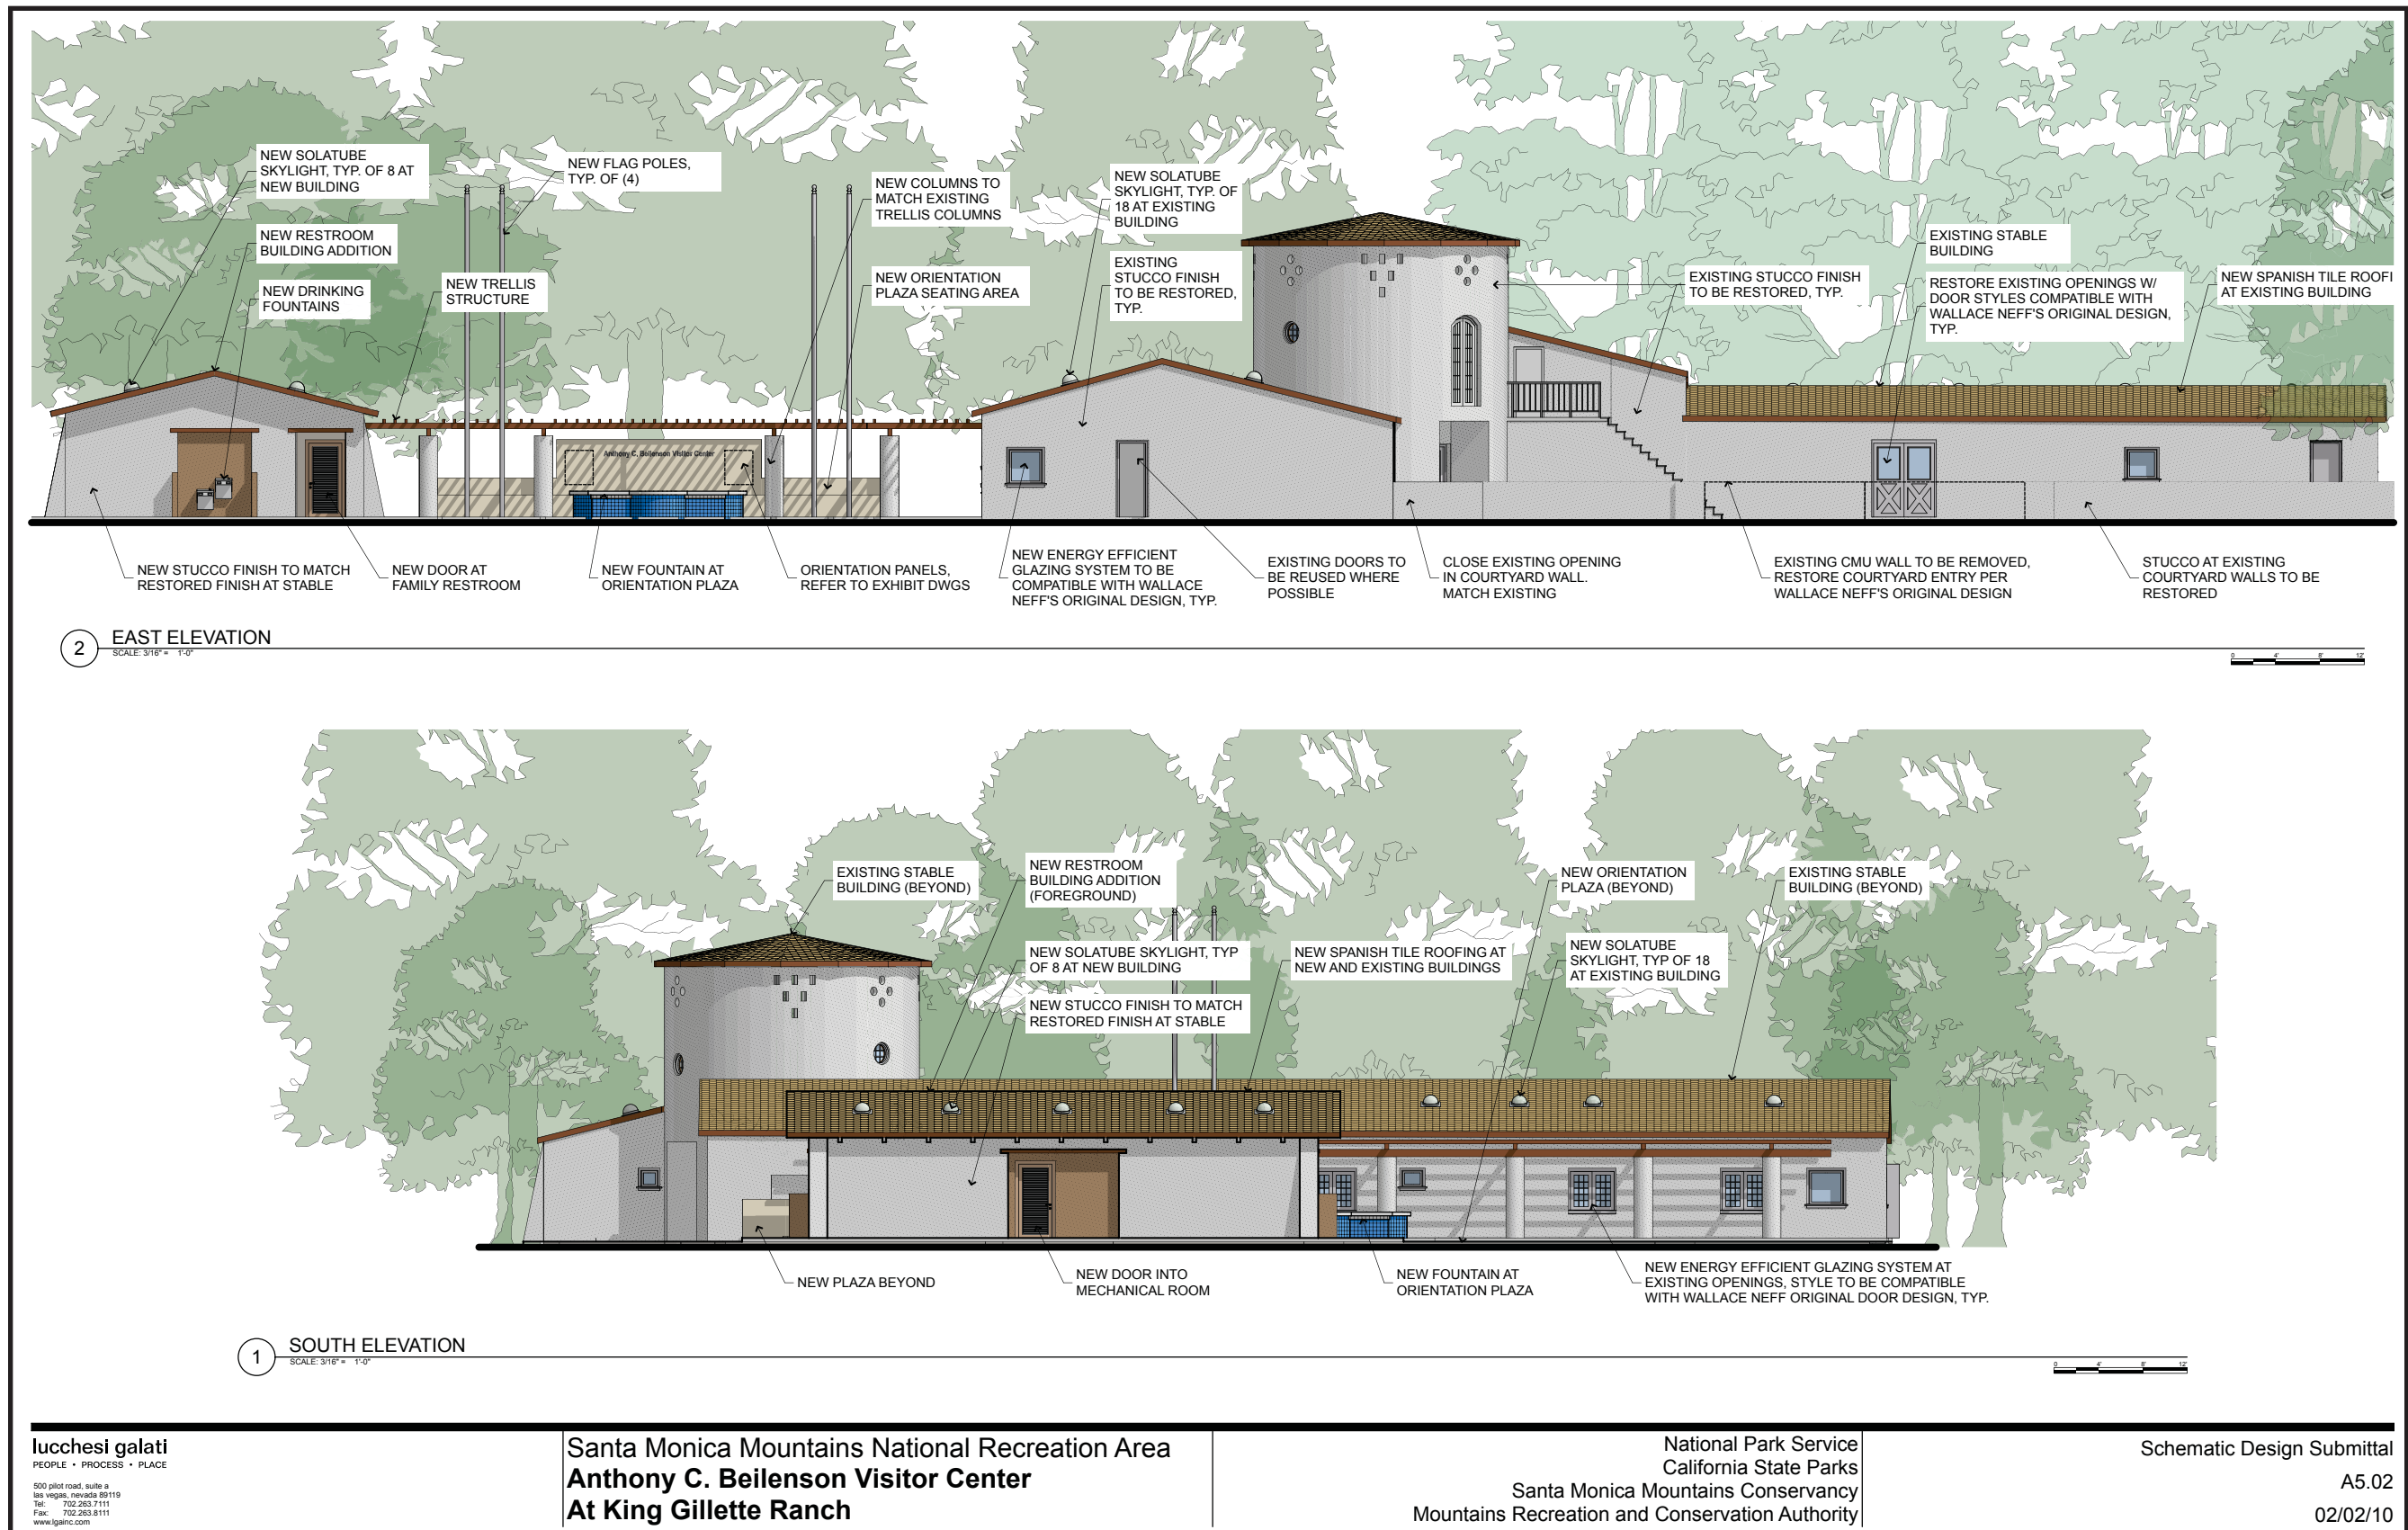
Preferred Alternative---Proposed Visitor Center East and South Elevations
